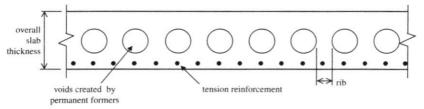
Cross-section through a hollow slab cast with permanent void formers
